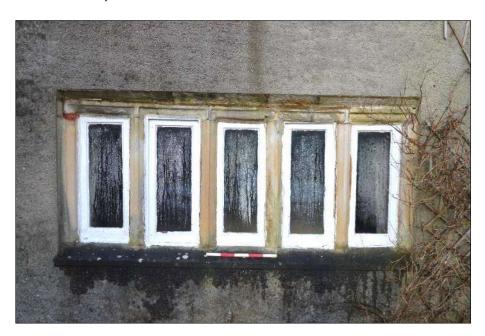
(shot 113): Mullioned 5-light window on the southeast elevation, looking north-northwest, 0.5m scale
